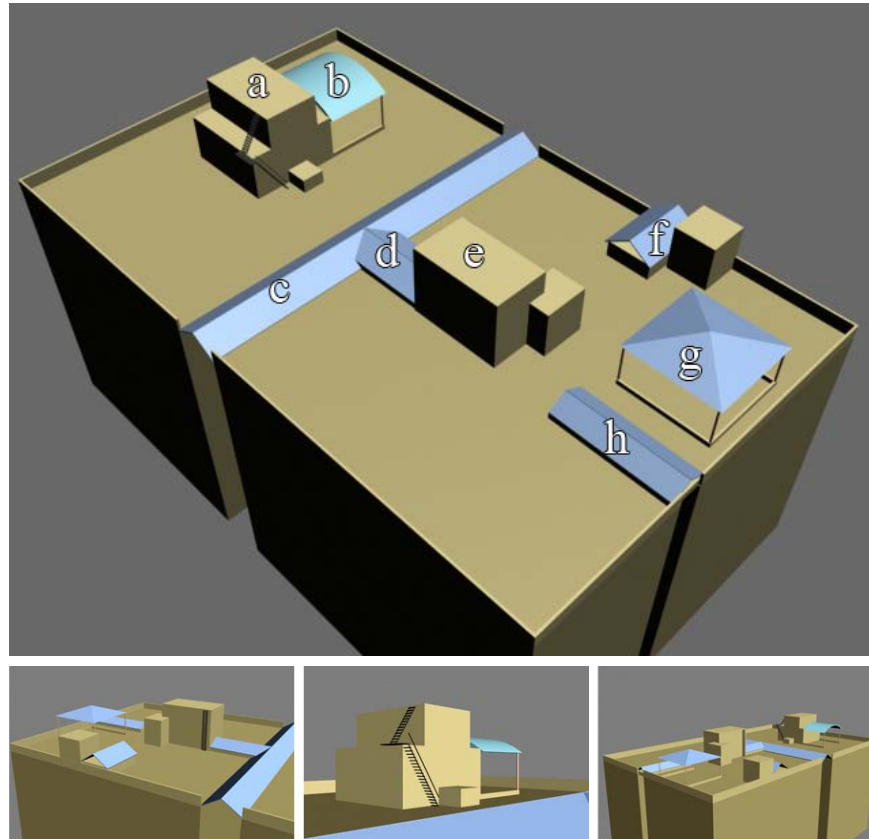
3D perspective of the roof of House no. 63 (Dhanmondi Road no. 8/A)
